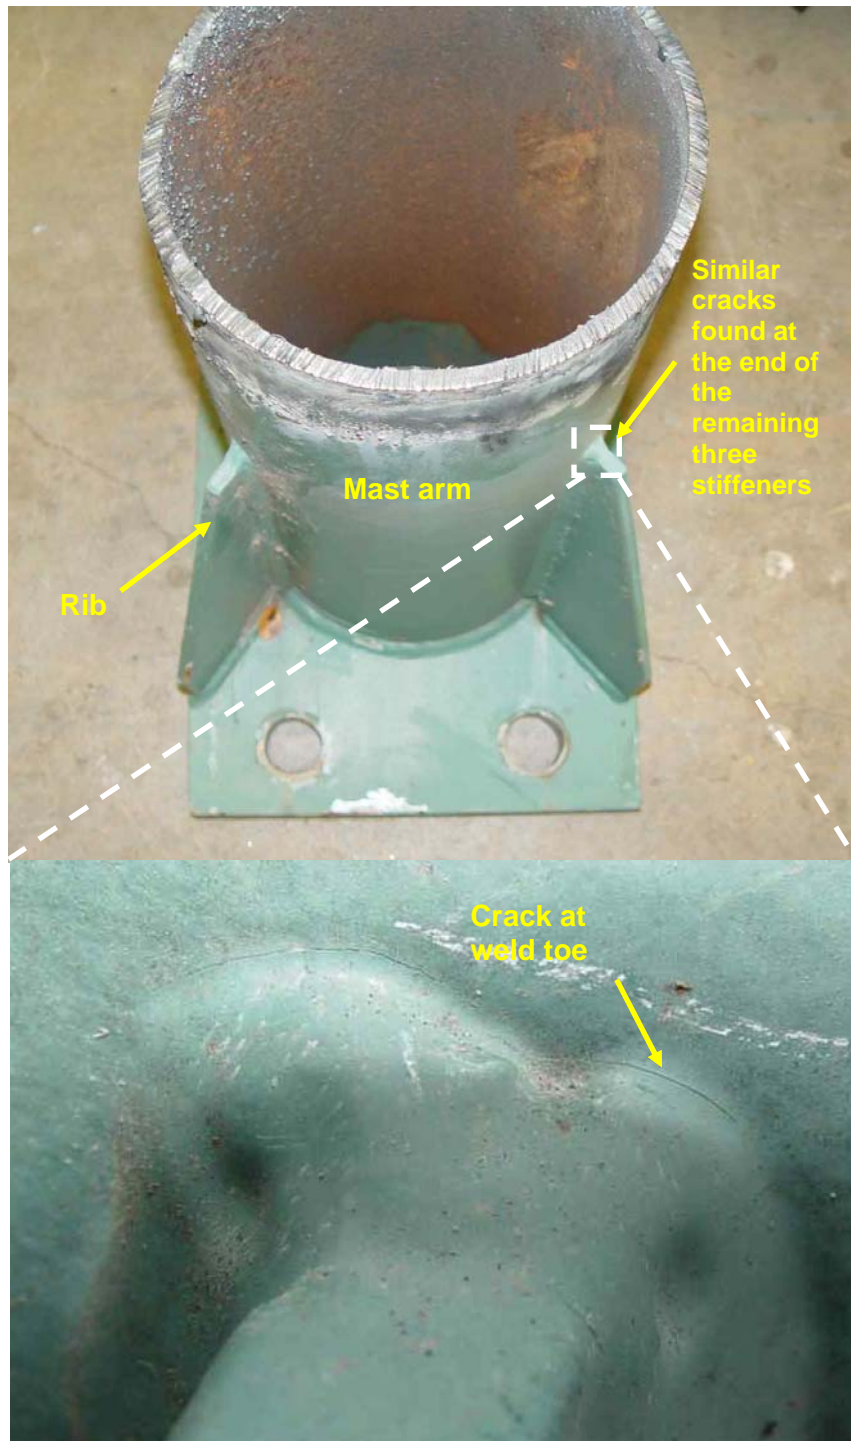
Connection flange detail of the mast arm showing a close up of a crack found at the end of the rib that is fillet welded to the pole's outer shell
